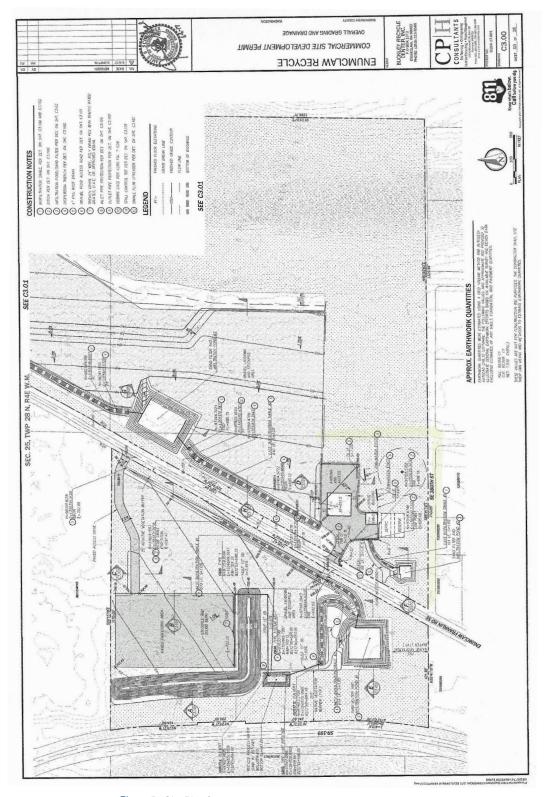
Site Plan for the proposed ERC mulching facility, ERC, 2018
